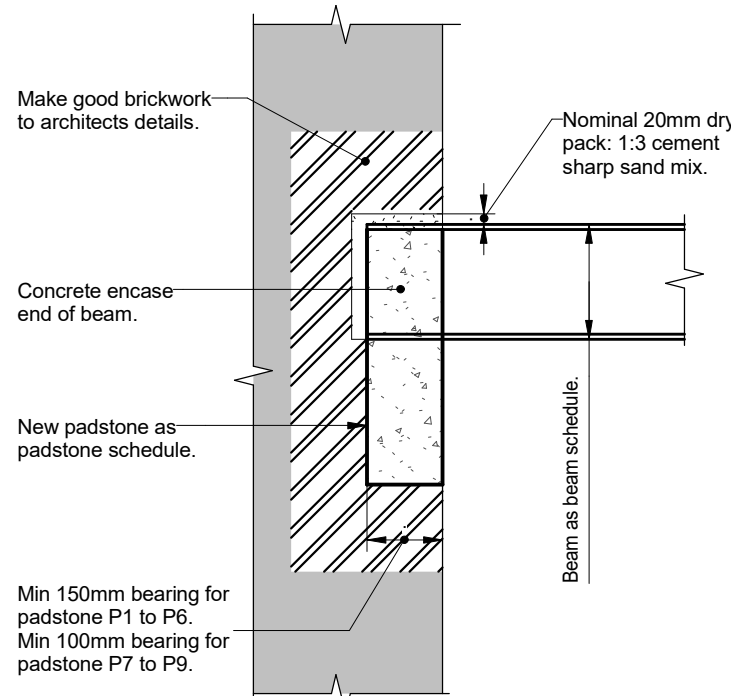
New Steel Beamed Opening in Load Bearing Wall
